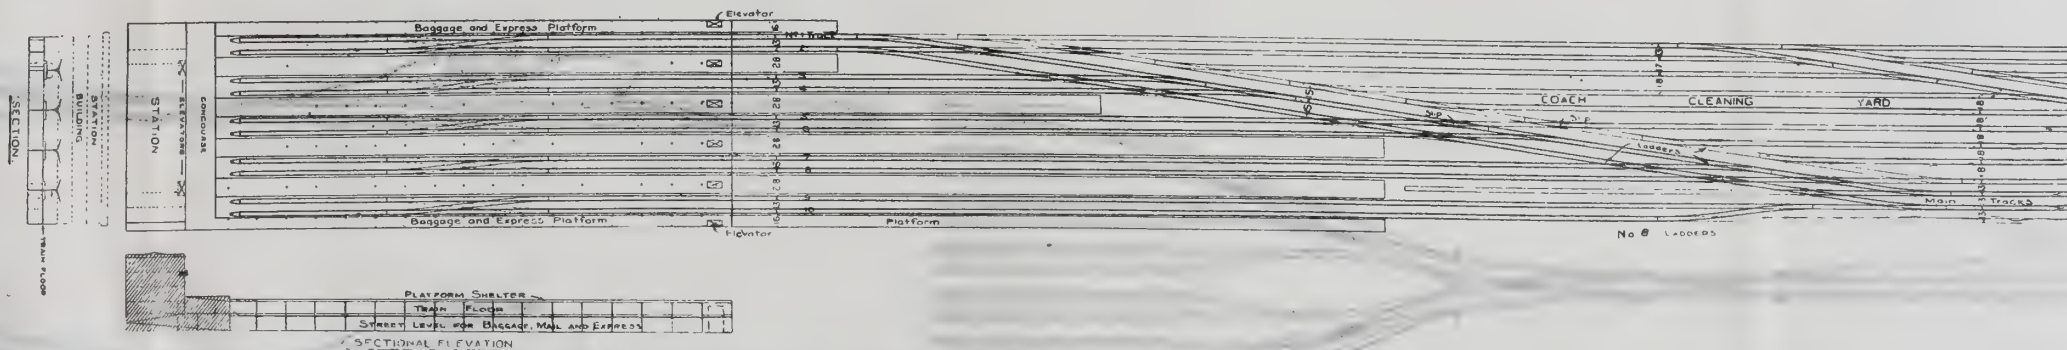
TYPICAL TRACK LAYOUT AT DEAD-END PASSENGER TERMINAL STATION.
